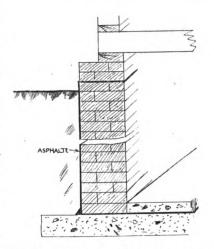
A layer of asphalt can be mopped outside the wall and through it as shown
